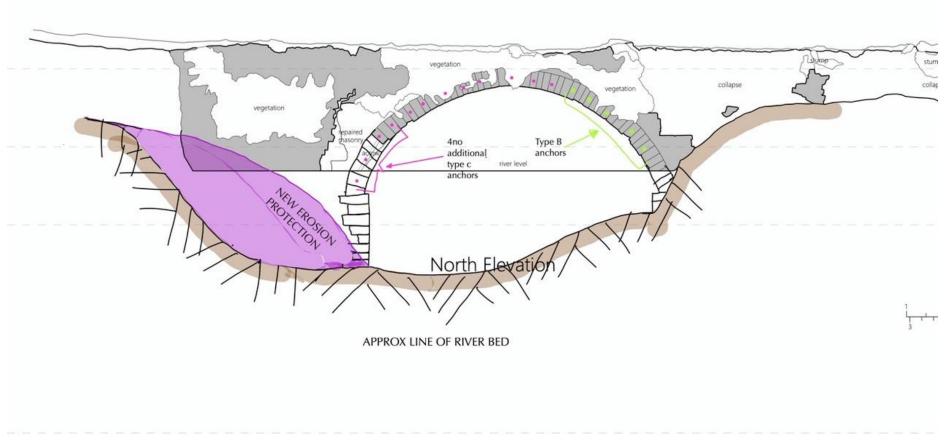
Cintec anchor locations, north elevation – Carl Morgan Building Surveyor.
